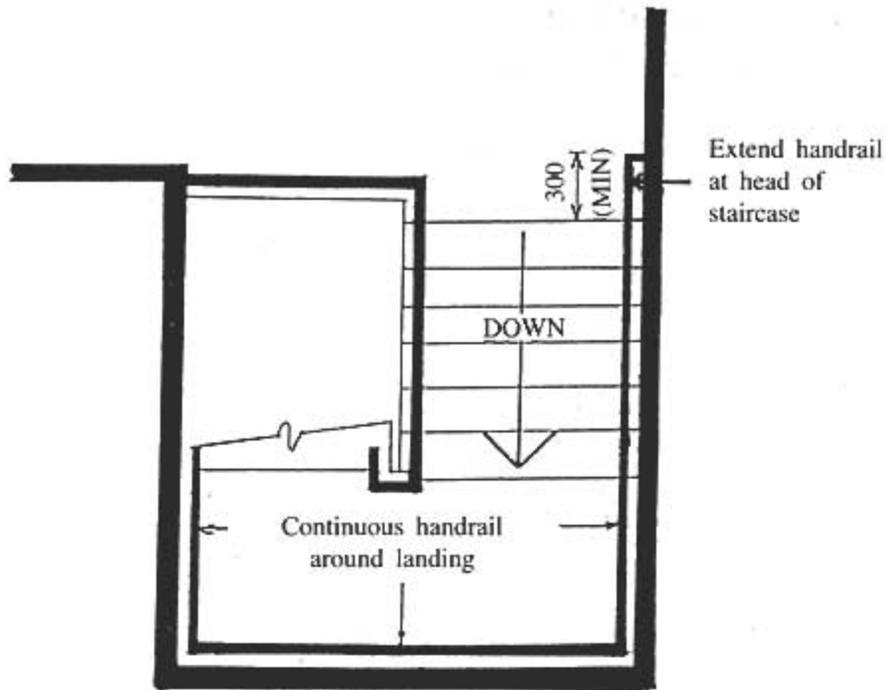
EXAMPLE OF STAIRCASE PLAN
